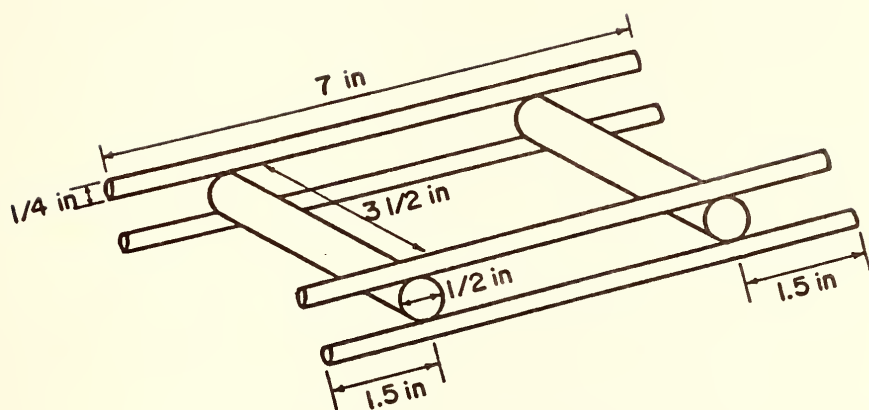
Sketch of Steel Mat Embedded in Concretes
